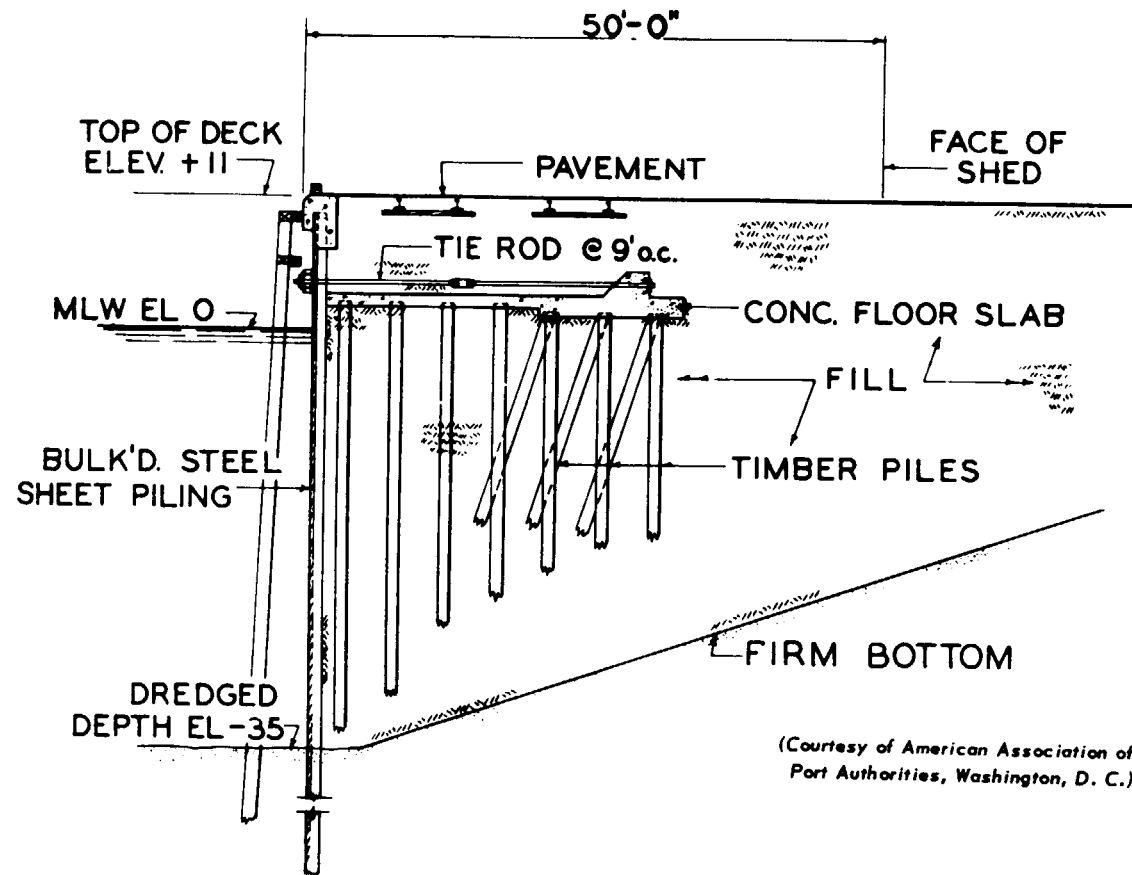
Solid fill type wharf construction with steel sheet pile bulkhead and relieving platform anchor.
